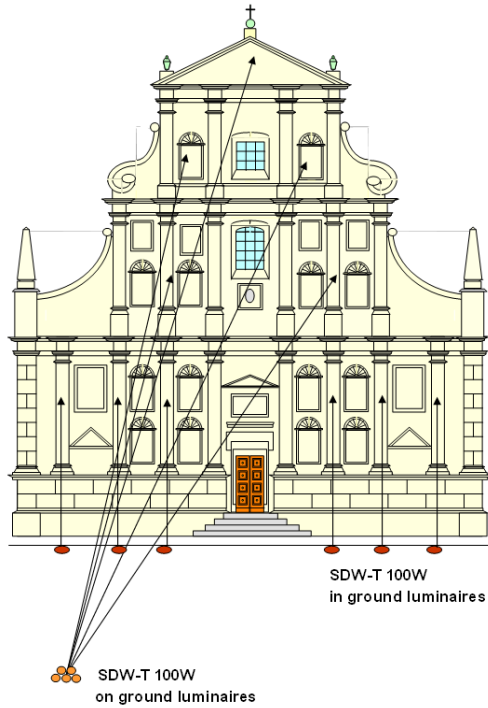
Front elevation of St. Joseph church – the position of luminaires.
